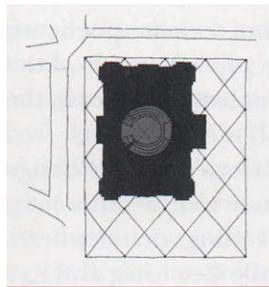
Reichstag ,Berlin, plan (Byard 1989, p.73)
